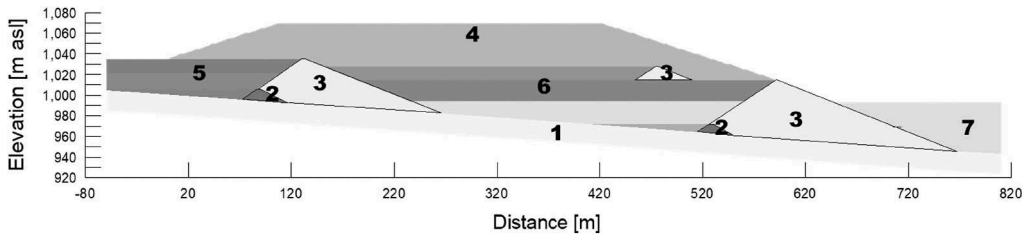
Representative longitudinal section, according to the Conceptual design of 2020.06.26. (1) sand and gravel (alluvium), (2) shale (initial dam), (3) sand - cycloned (dams 1, 2-1, 2-2), (4) dry disposal - embankment, (5) mud 1 - cycloned (lagoon 1), (6) mud 2 - cycloned (lagoon 2), (7) mud 3 - cycloned (lagoon 3-1).
